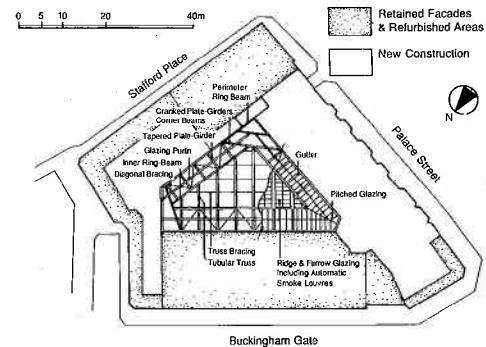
Roof plan showing steel work layout and profile of buildings below
